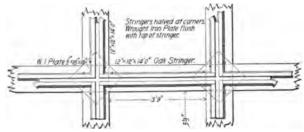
Track Crossing Laid on Framed Timbers; C., B. & K. C. Ry.
